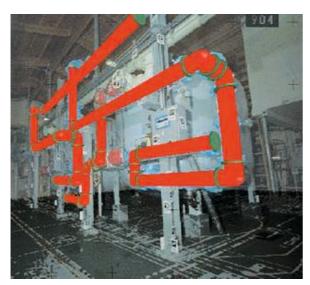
Augmentation of a photogrammetric image of a waste water plant by the associated floor map and 3D reconstruction of pipework
